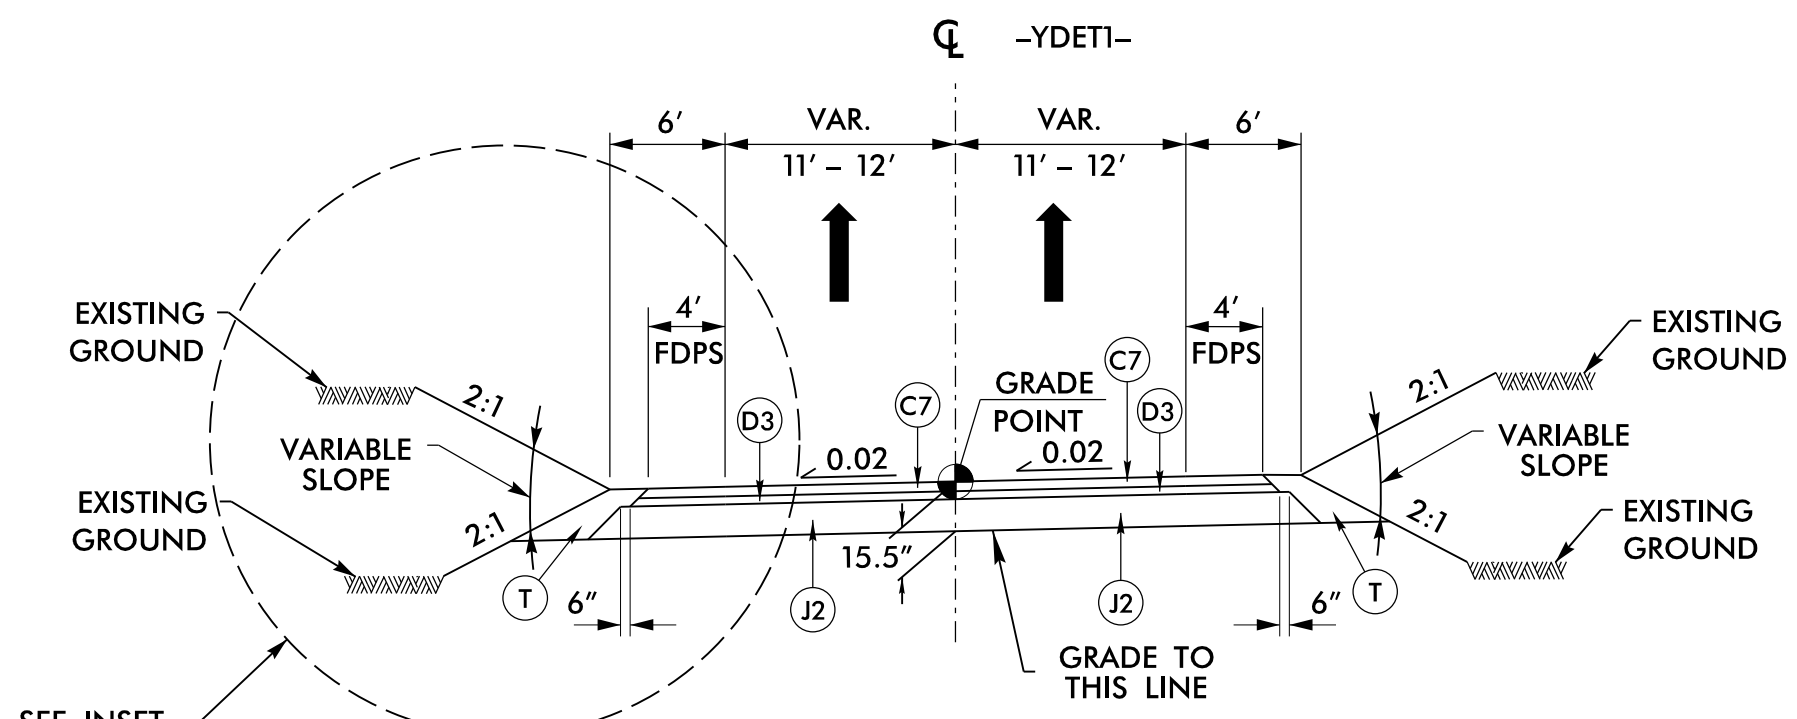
TEMPORARY DETOUR PAVEMENT
